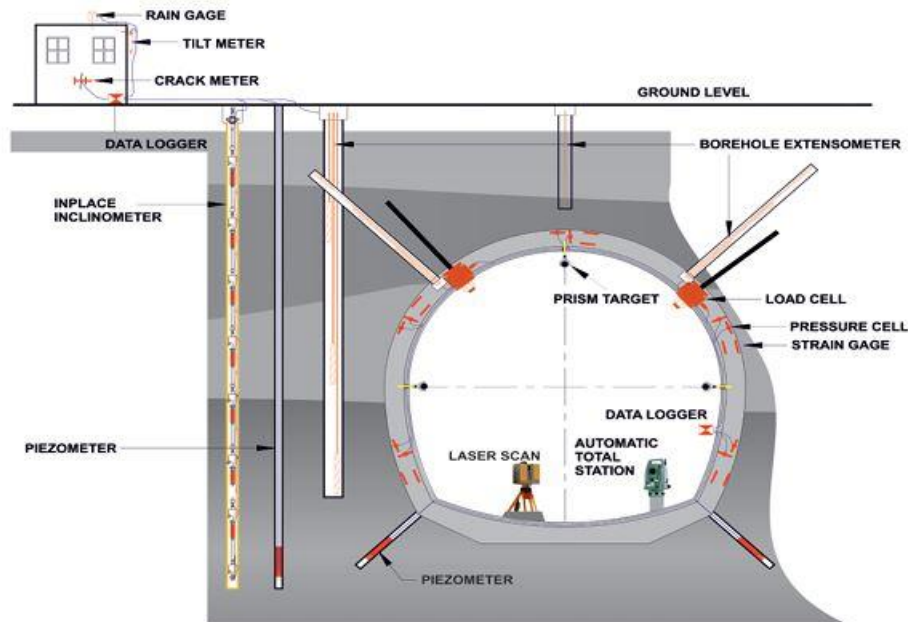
Layout Diagram of Typical Geotechnical Monitoring Systems Used in Conventional Tunnel Excavations (Encardio-Rite Instrumentation).
